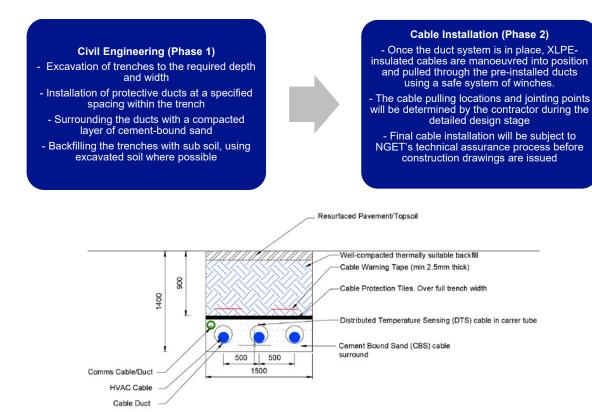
Illustration of a typical trench installation (measurements are subject to detailed design)
